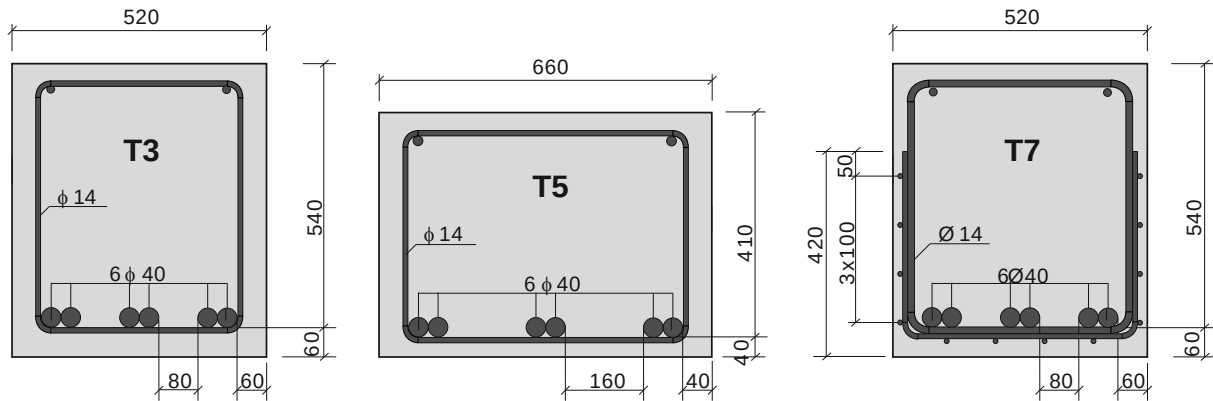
Cross-sections of beam tests T3 (left), T5 (centre) and T7 (right)
